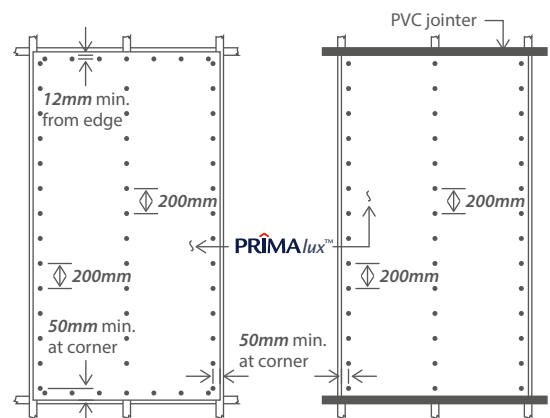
PRIMA^{lux}™ Ceiling Laid Parallel to Joists
